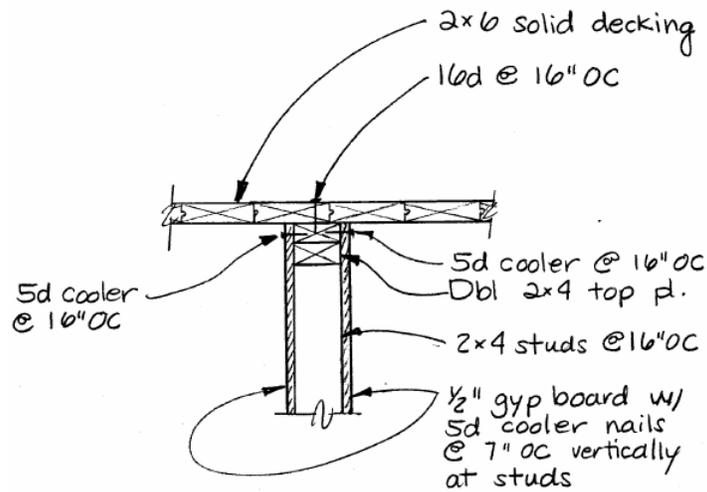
Index building 3 top of interior wall parallel to deck (detail 5-S3)
